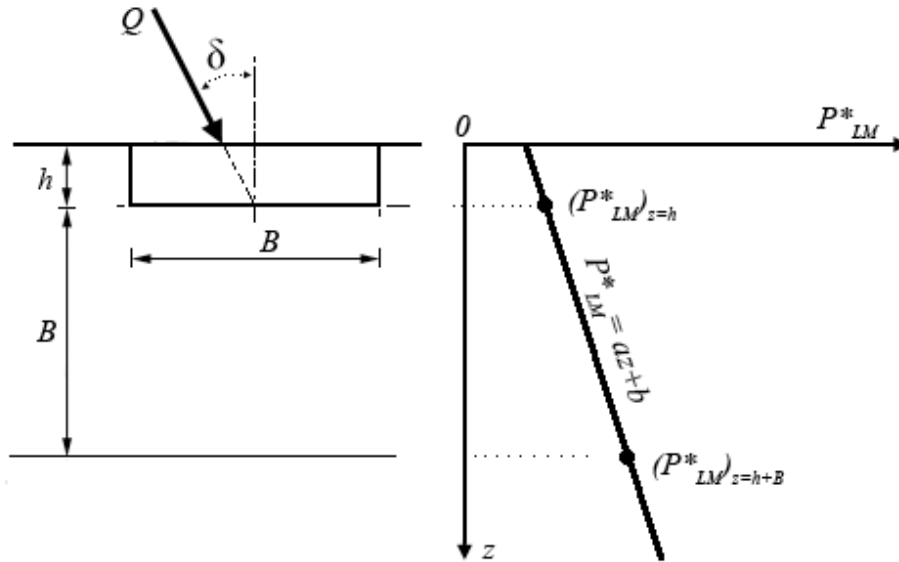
Inclined load on footing (Baguelin et al., 1978)
